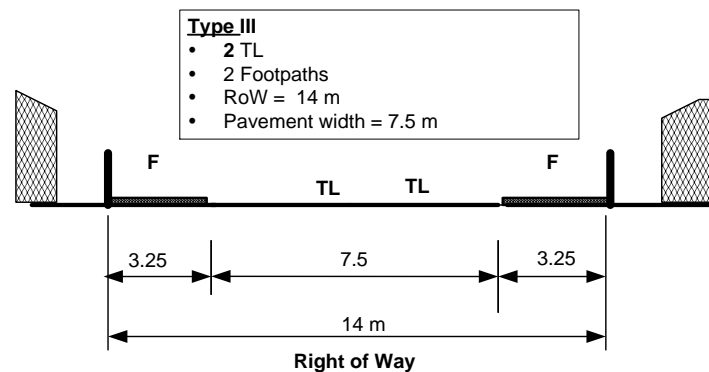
, Typical Cross-section for Class A Roads (with RoW 14 m)
